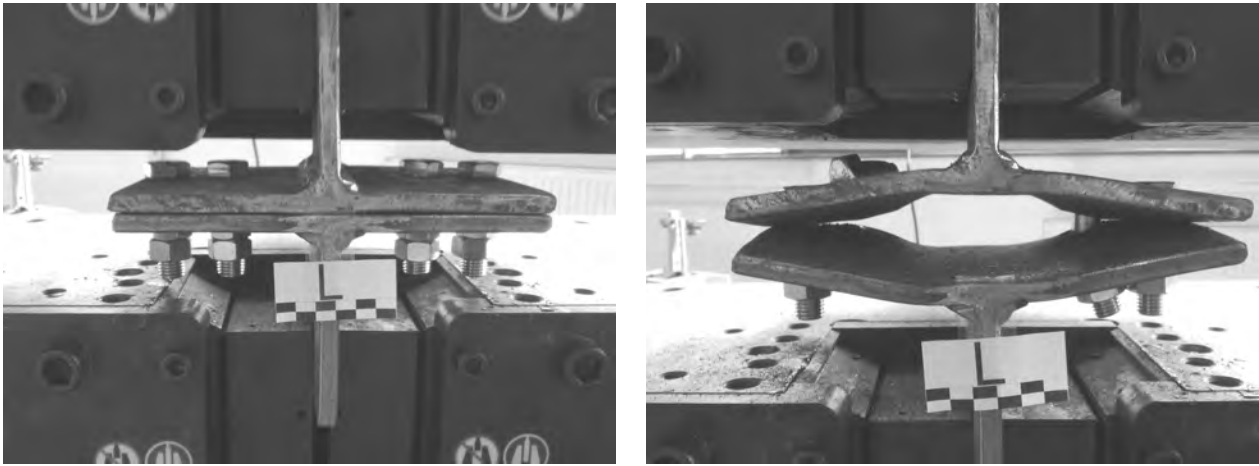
T-stub specimen on testing machine before test and in final test moment
